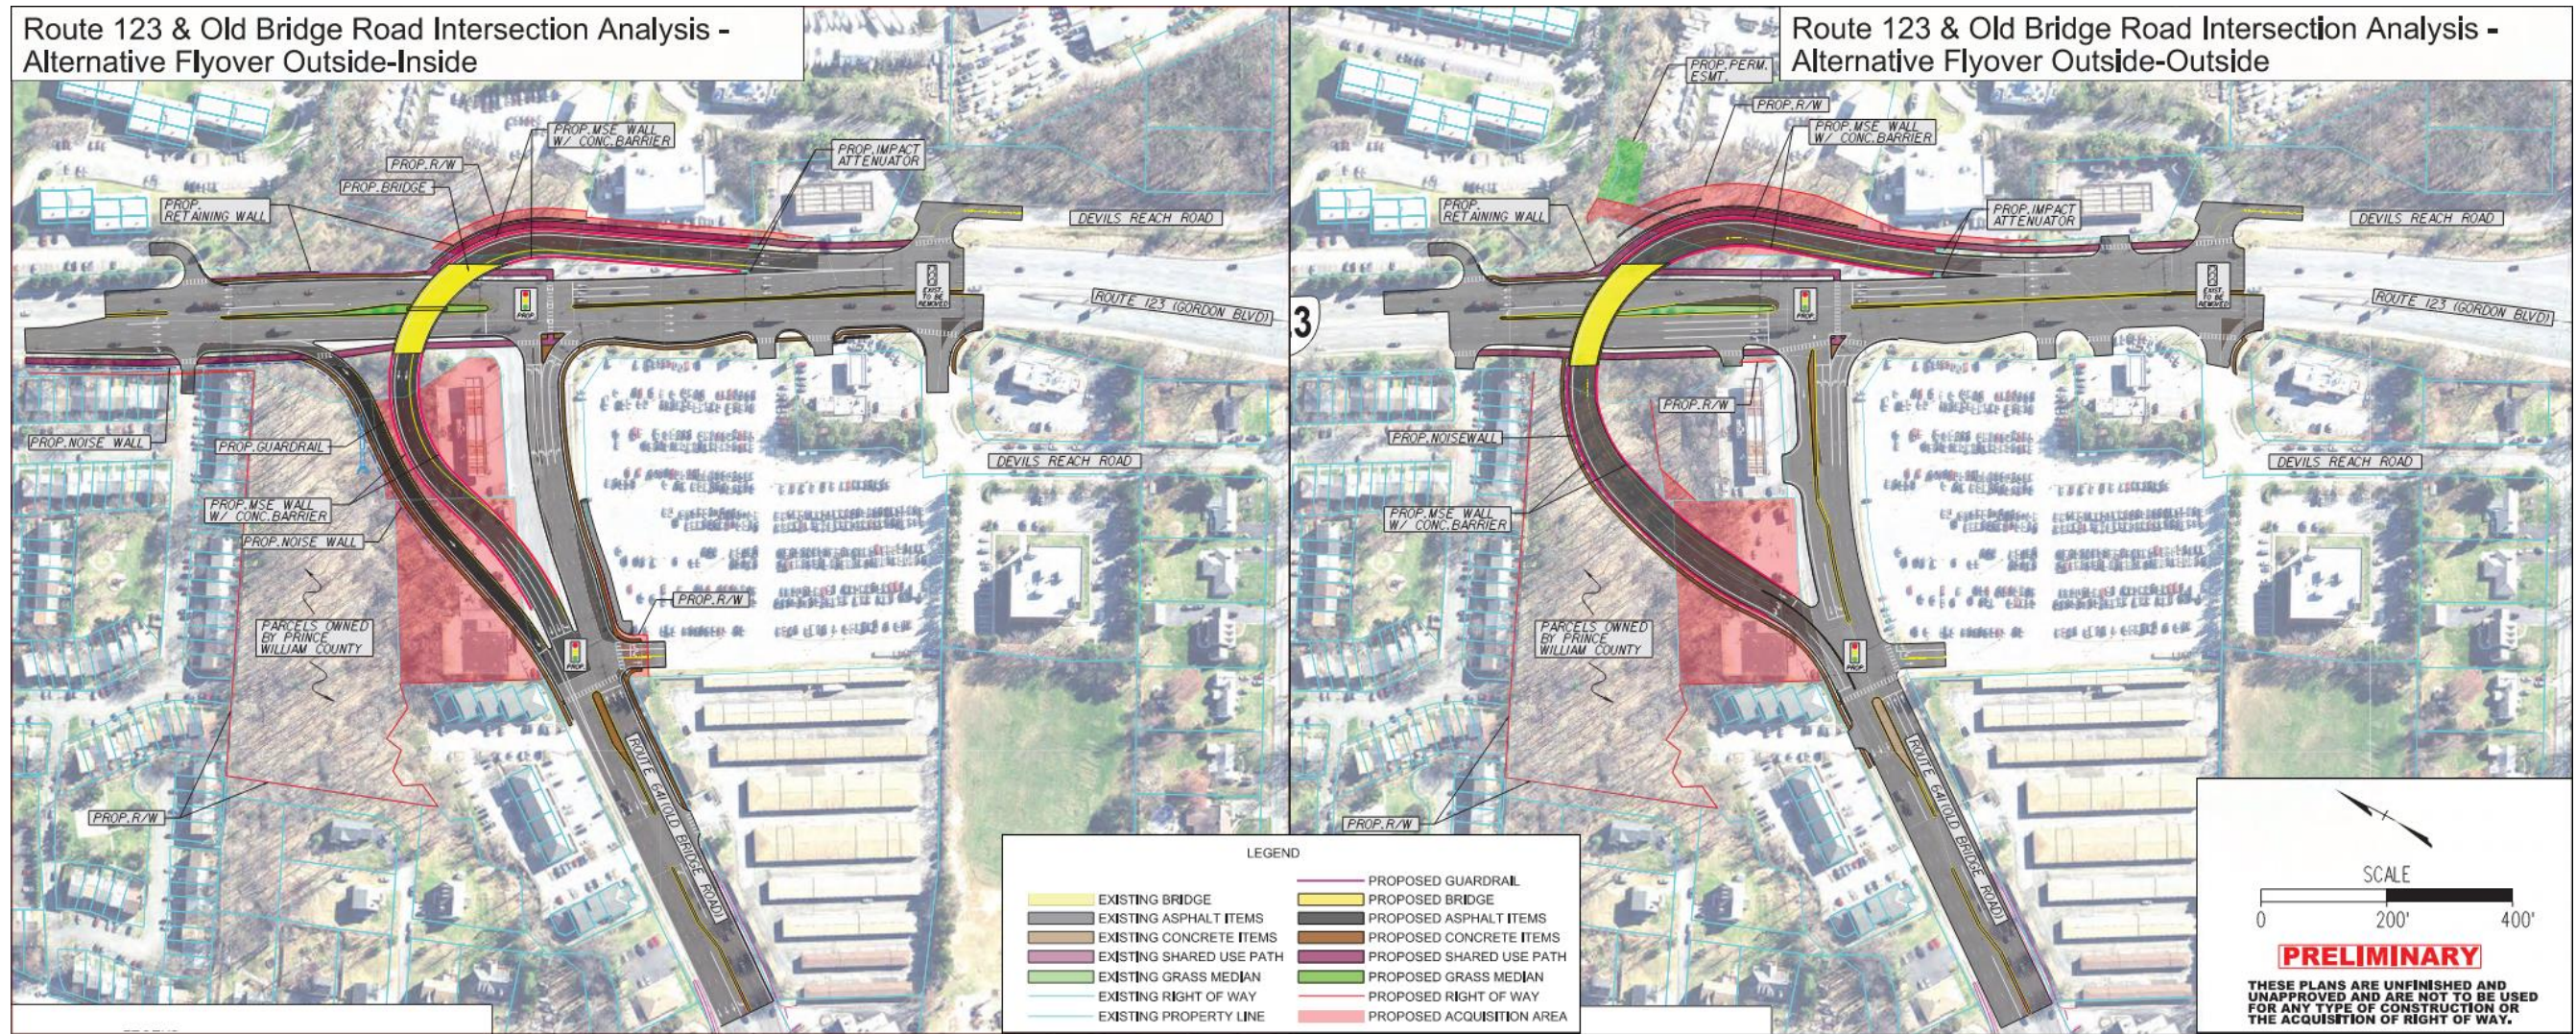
Recommended Route 123 at Old Bridge Road Alternatives
